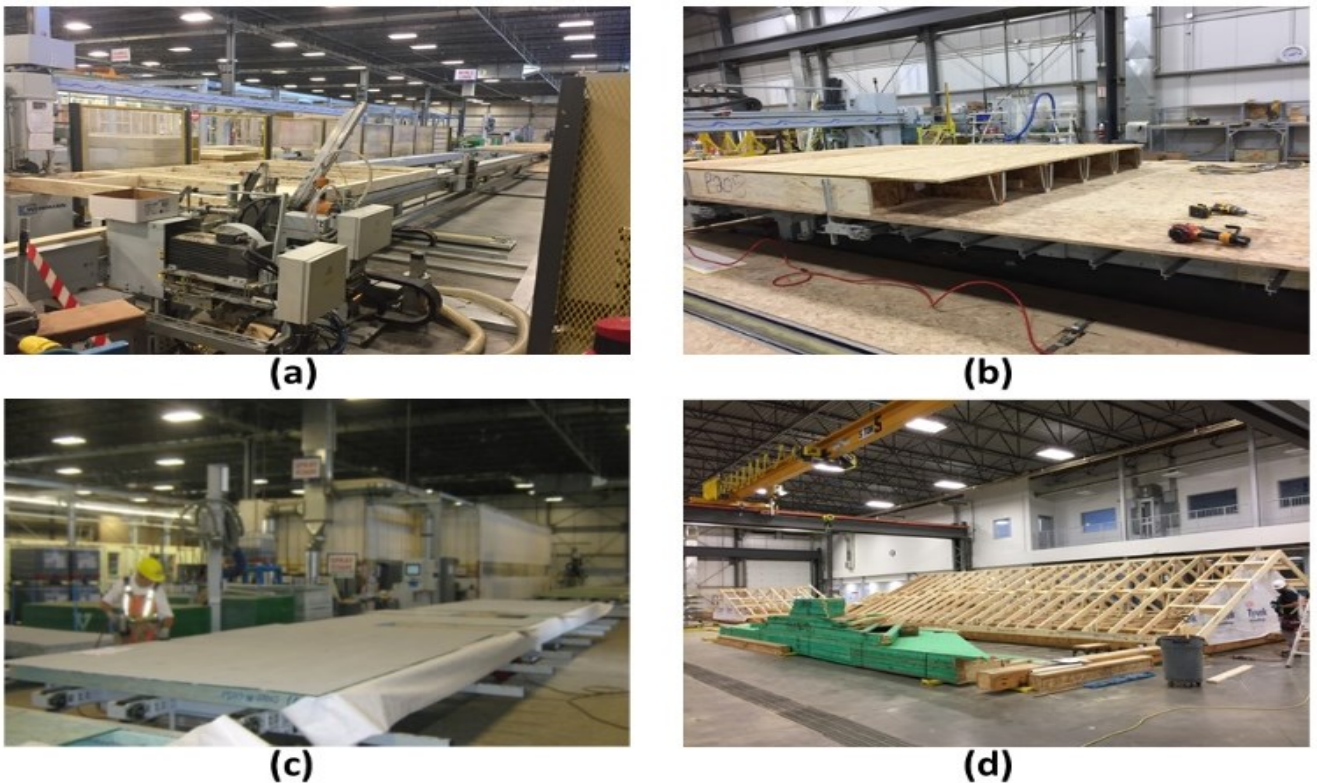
Typical factory-based home construction facility: (a) Wall line, (b) Floor line, (c) Wall sheathing station, and (d) Roof production station (source: ACQBUILT Inc. 2019).
